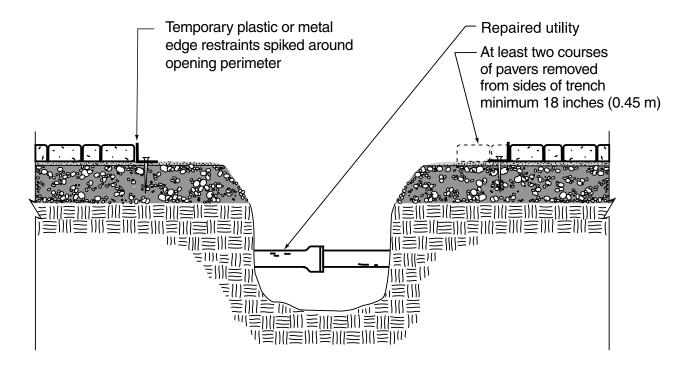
This figure shows how the layers are peeled back to allow access under the pavement for repair work.
